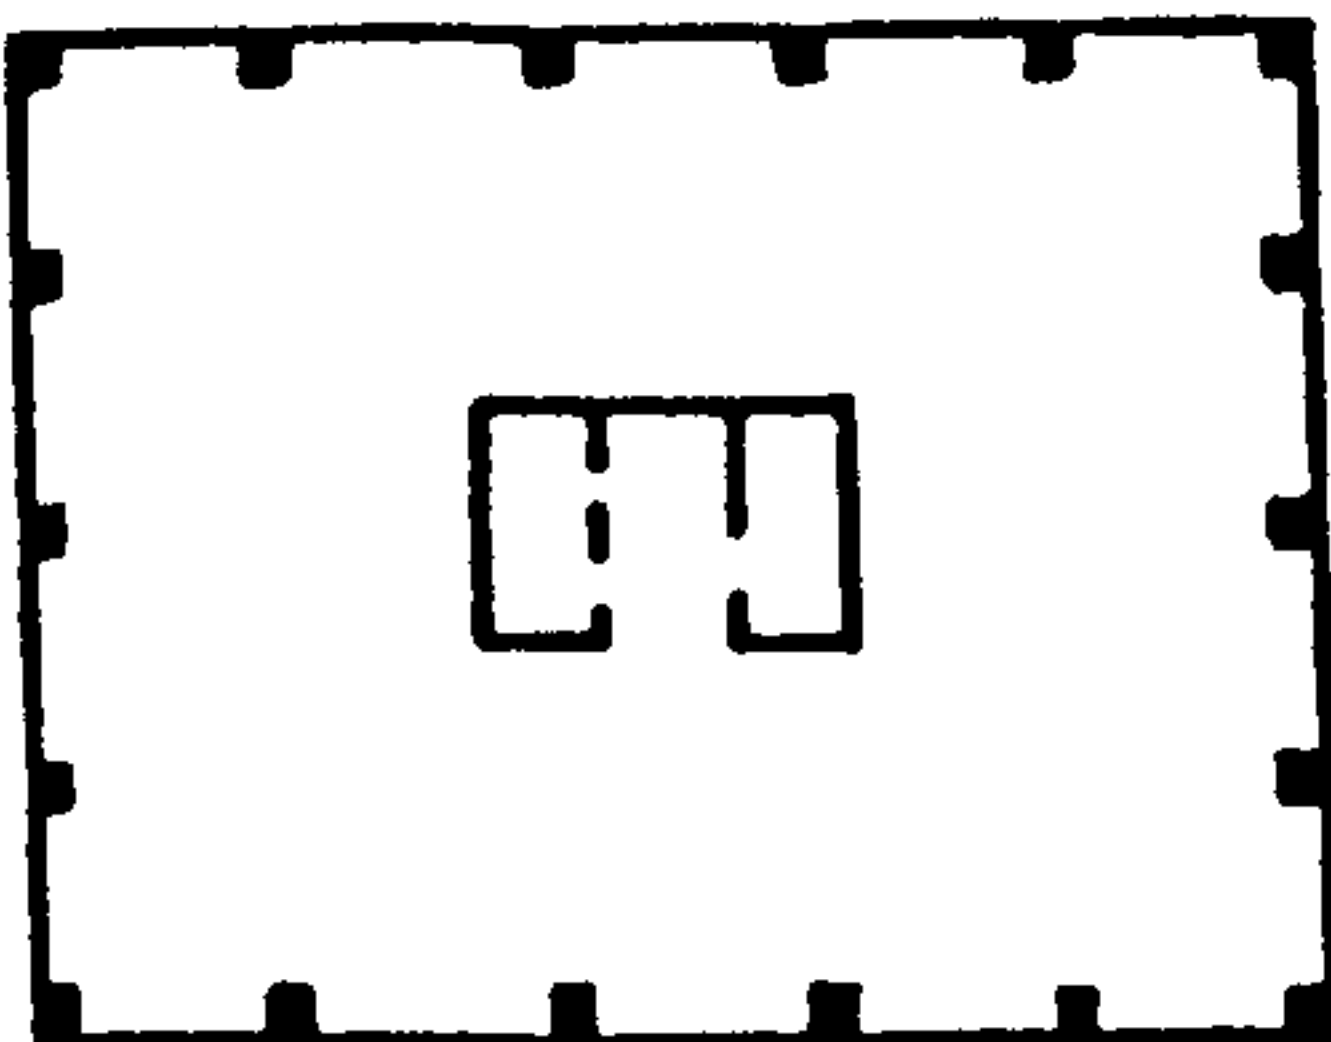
(b) Typical layouts of high-rise buildings with shear wall-frame interaction
